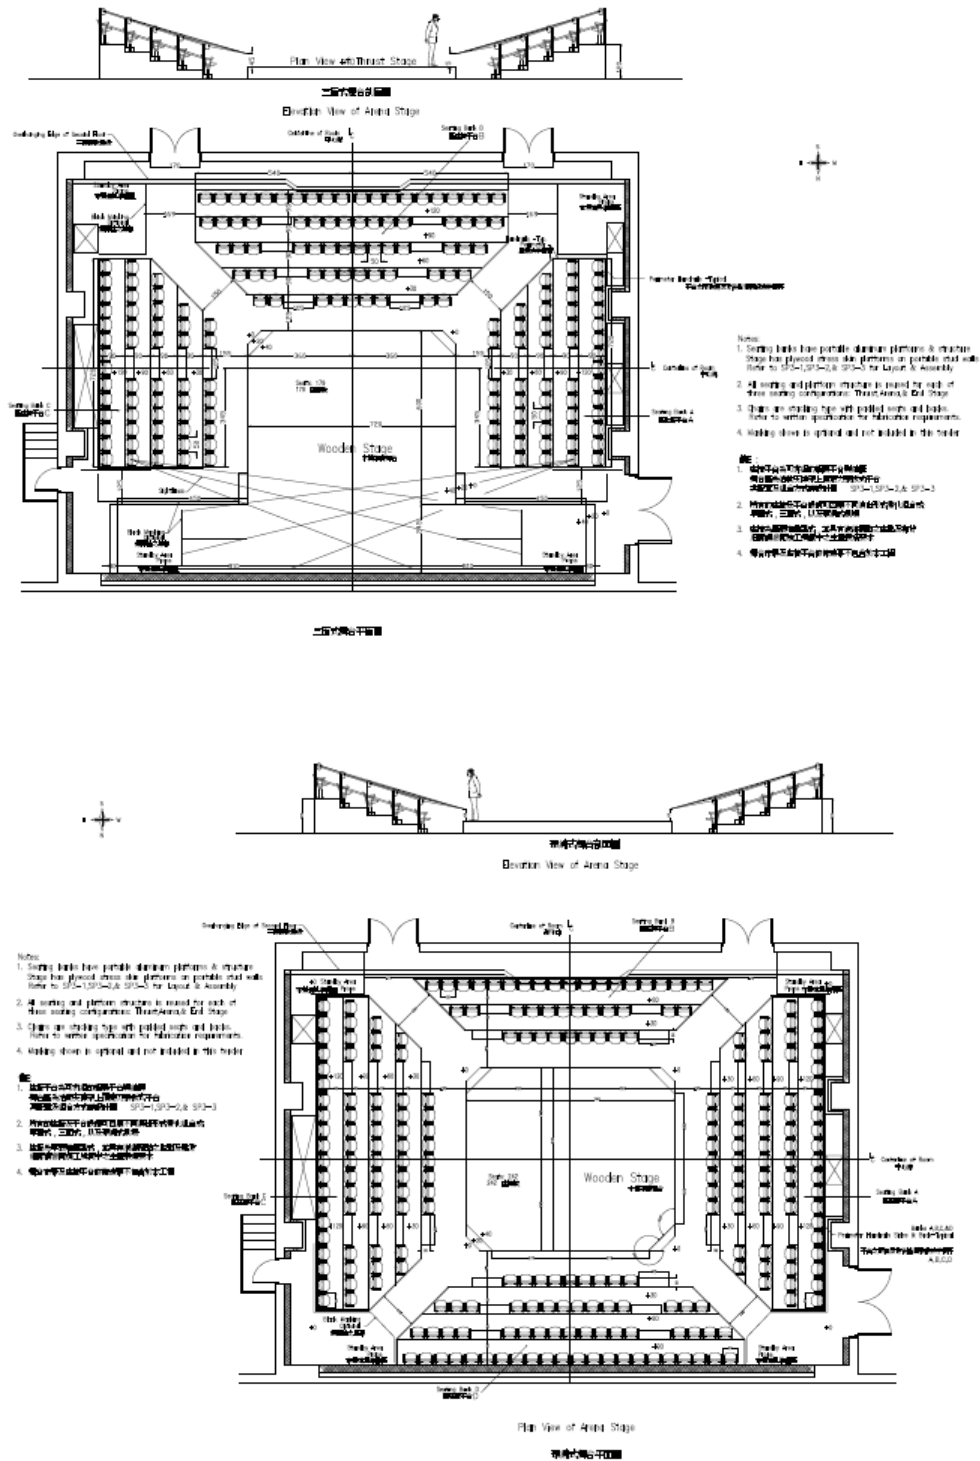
Experimental Theatre Seating Layout B and Sectional Elevation (Top) Experimental Theatre Seating Layout C and Sectional Elevation (Bottom). Source: National Theatre and Concert Hall of Taiwan
